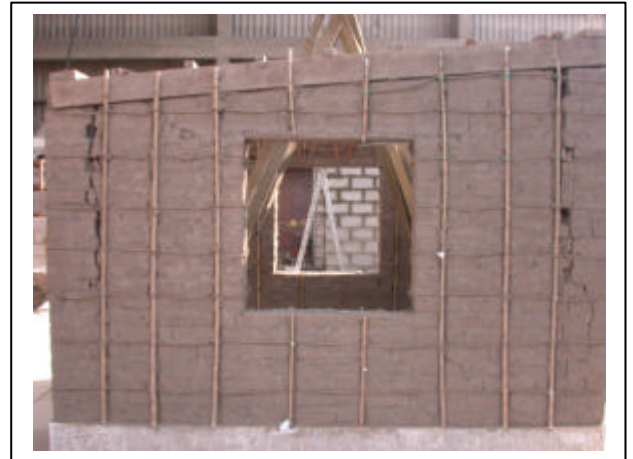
Model 1 North wall, plastered side. Vertical cracks appear at the intersection with transversal walls.
